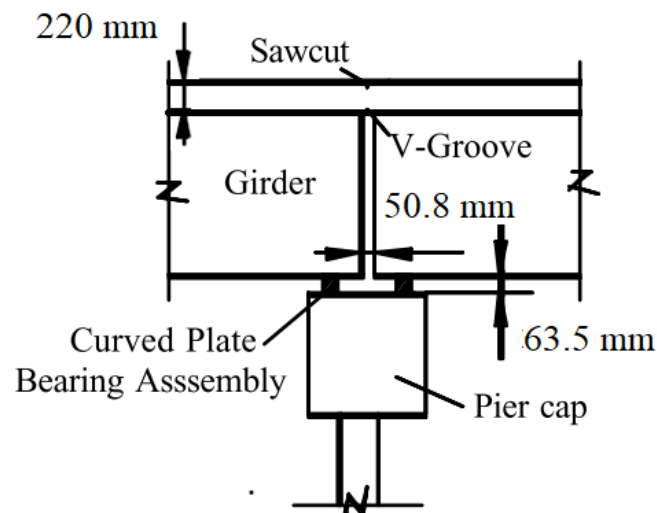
Pier Connection Detail (after Huang et al. 2004)
